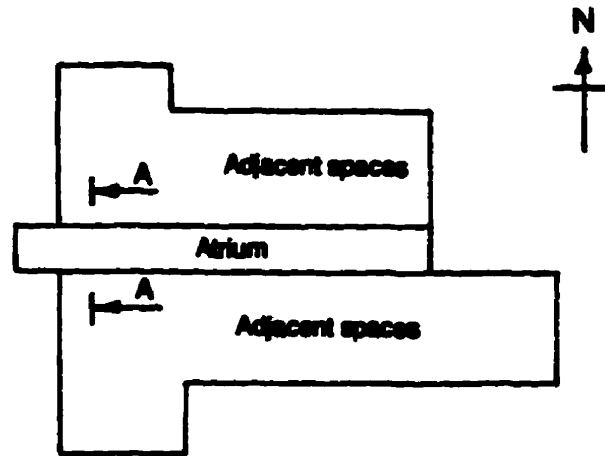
Plan of EECS atrium building, the University of Michigan, Ann Arbor (adapted from [33])
